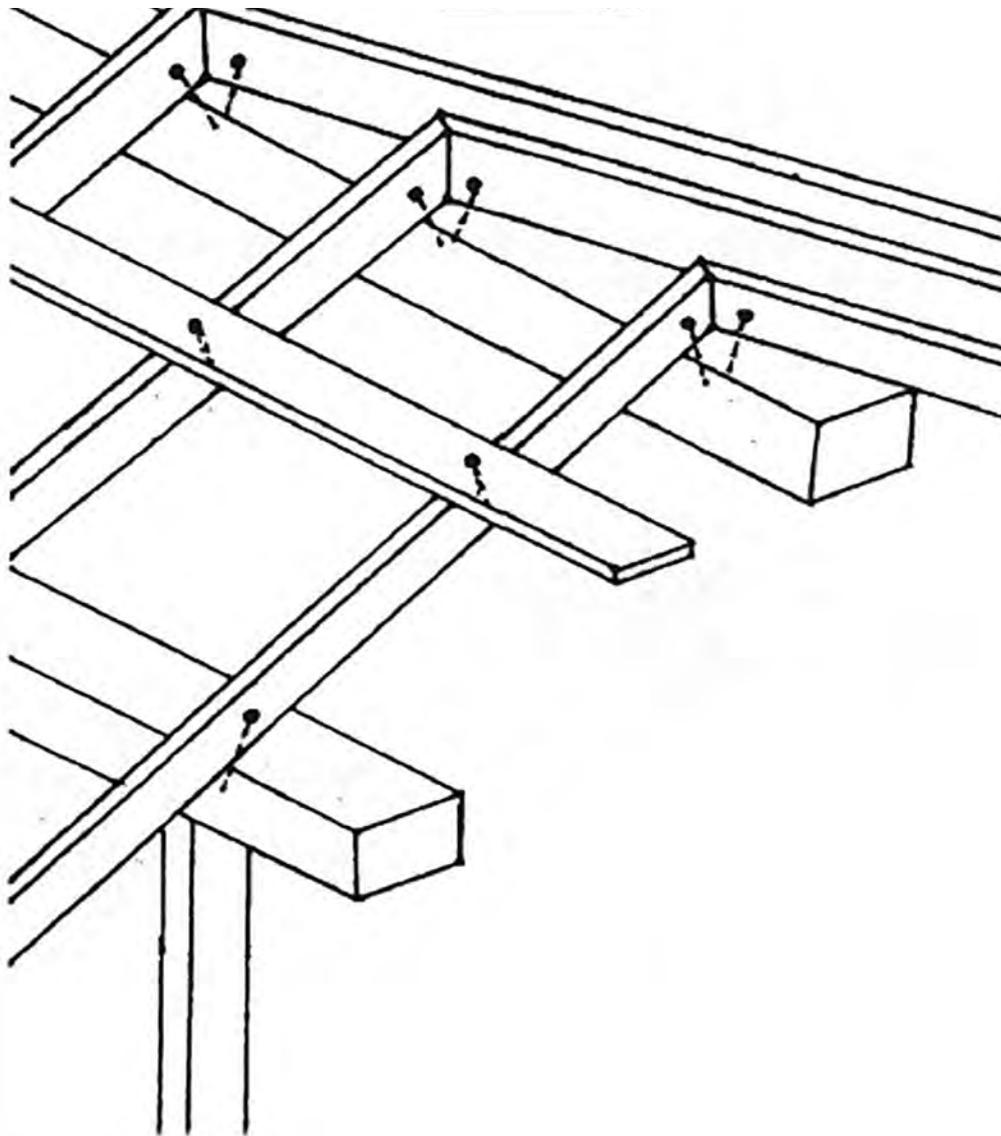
DO NOT DEPEND ON THE NAILS ALONE TO KEEP YOUR ROOF UNLESS YOU HAVE USED SPECIAL PURPOSE ANCHOR NAILS OR SCREWS BOTH WITH CYCLONE WASHERS
